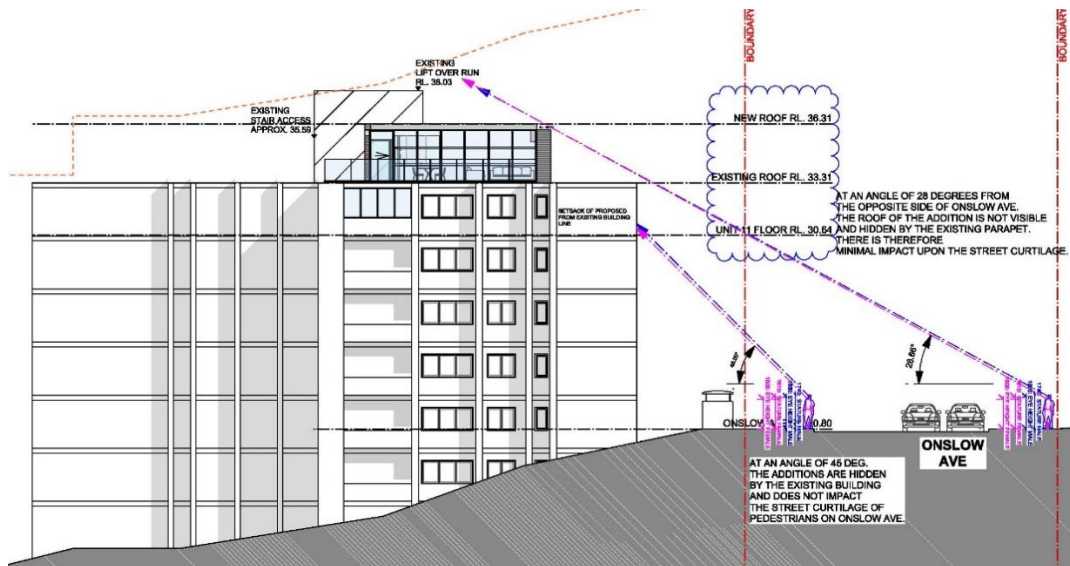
North elevation of existing building and proposed addition showing setback from Onslow Avenue and additional height in storey
